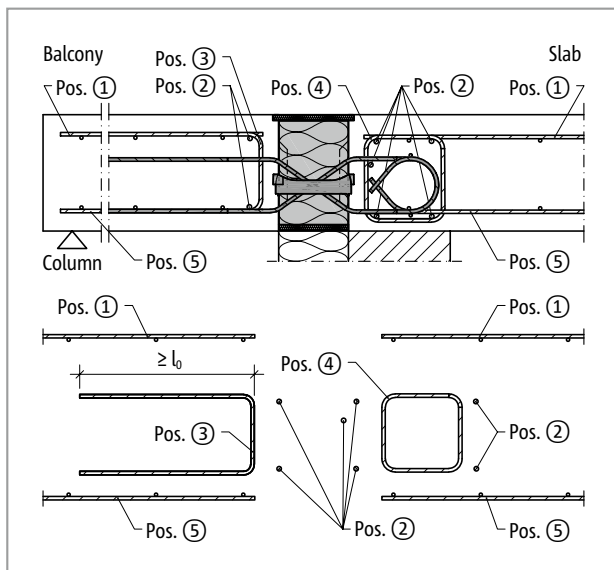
Schöck Isokorb® XT type Q-VV1 to VV4 on-site reinforcement
